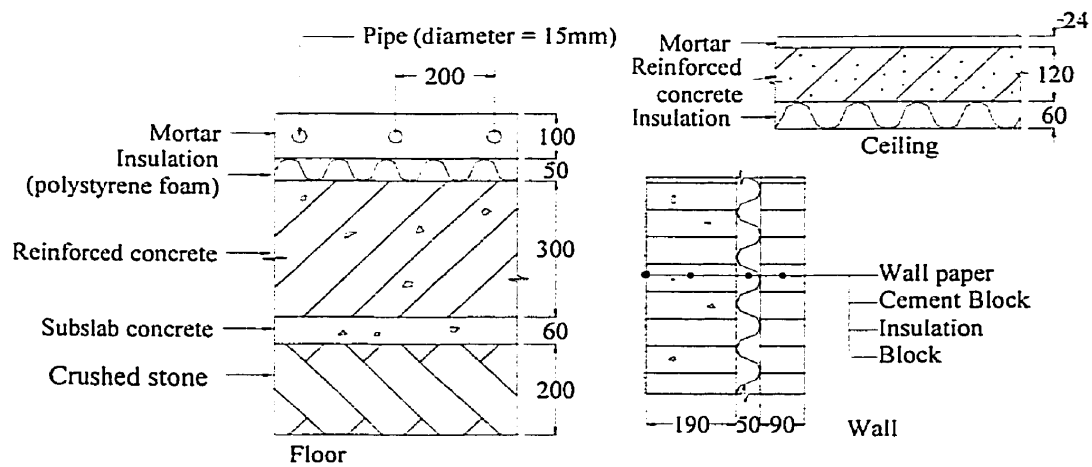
Cross-sectional details of the floor slab, walls and ceiling [8]
